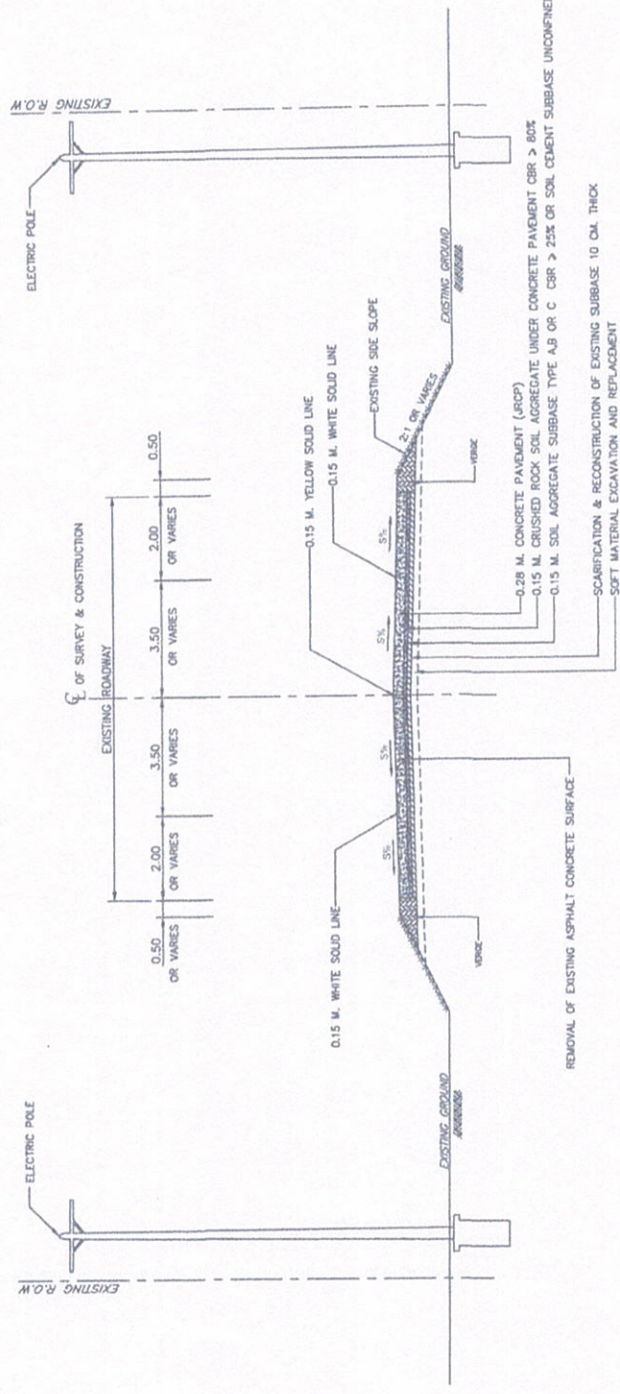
DETAIL OF SOFT SPOT EXCAVATION AND REPLACEMENT NOT TO SCALE
